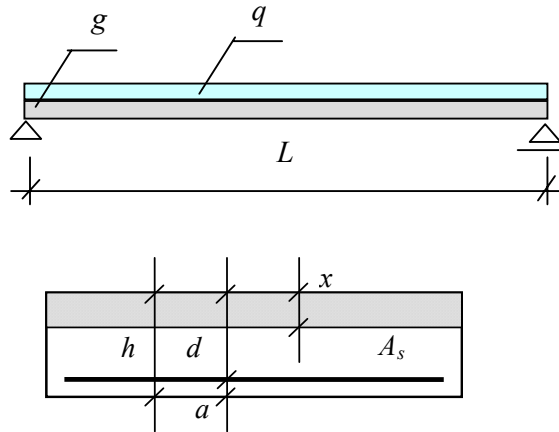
Simply supported reinforced concrete slab and its cross-section.
